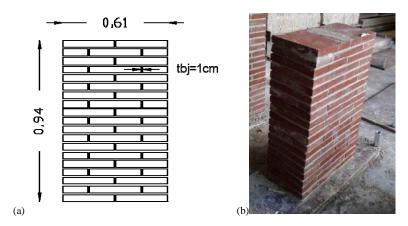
Masonry specimens to be tested for compression: (a) drawing; (b) as build.
